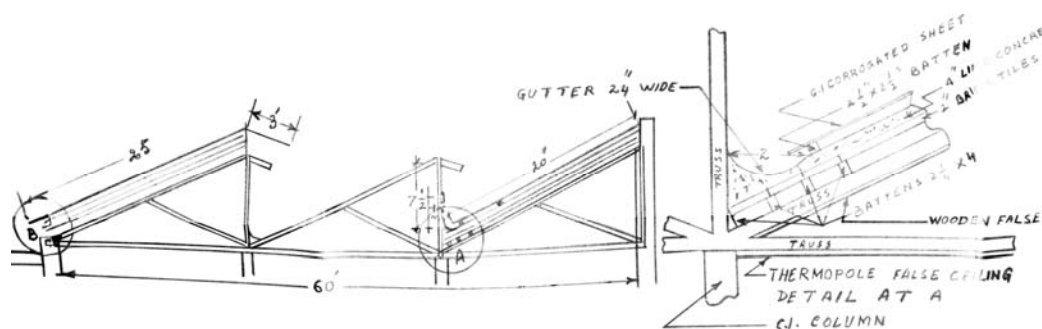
Section through the General Gallery Roof – Existing (1980)
